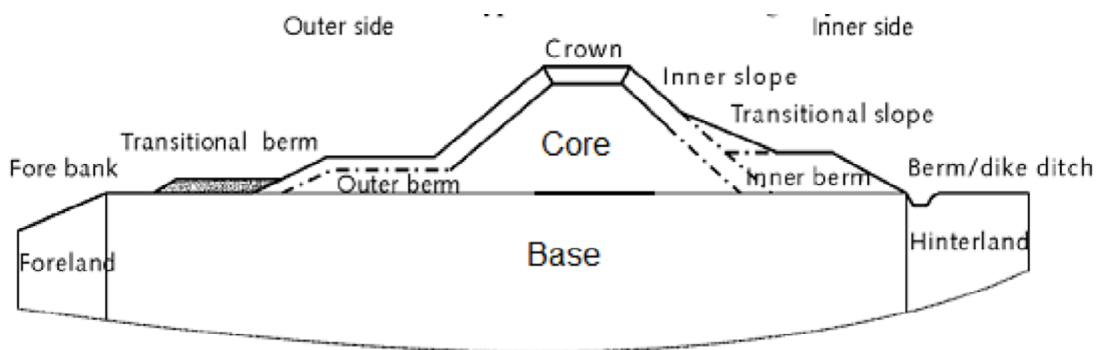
Transverse profile of a earth structure (Vrijling 2009)
